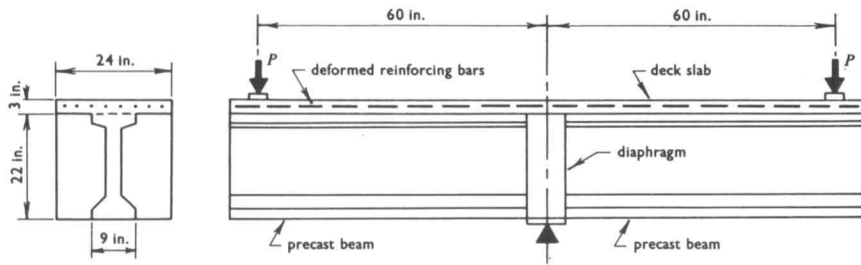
Figure I: Test of reinforced concrete joint between two precast prestressed concrete I beams.
